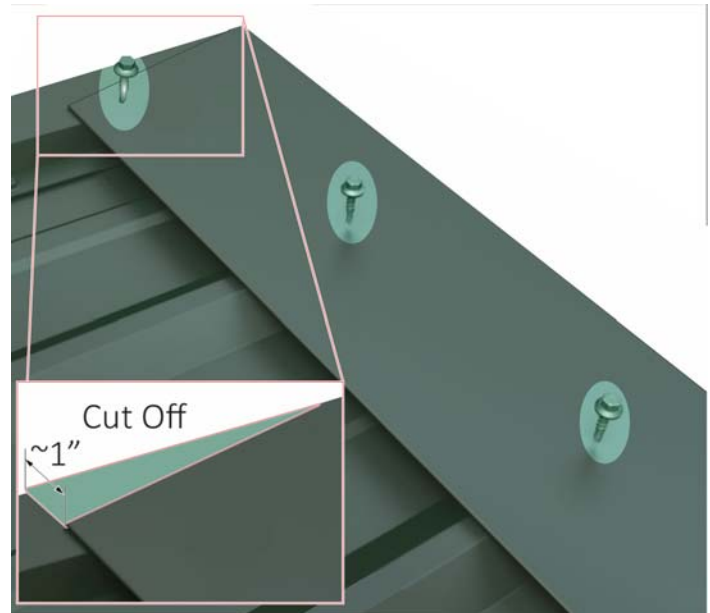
Attaching Front Edge Cap & Cutting Reliefs
